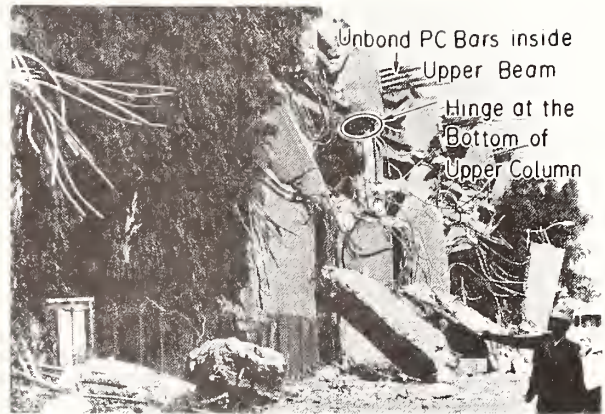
Collapse of Type 2 pier of Cypress Viaduct. Upper columns fell down due to failures at upper hinges. Reinforcements at the bottom of columns are seen. Unbond PC bars are seen atop (from CALTRANS).
